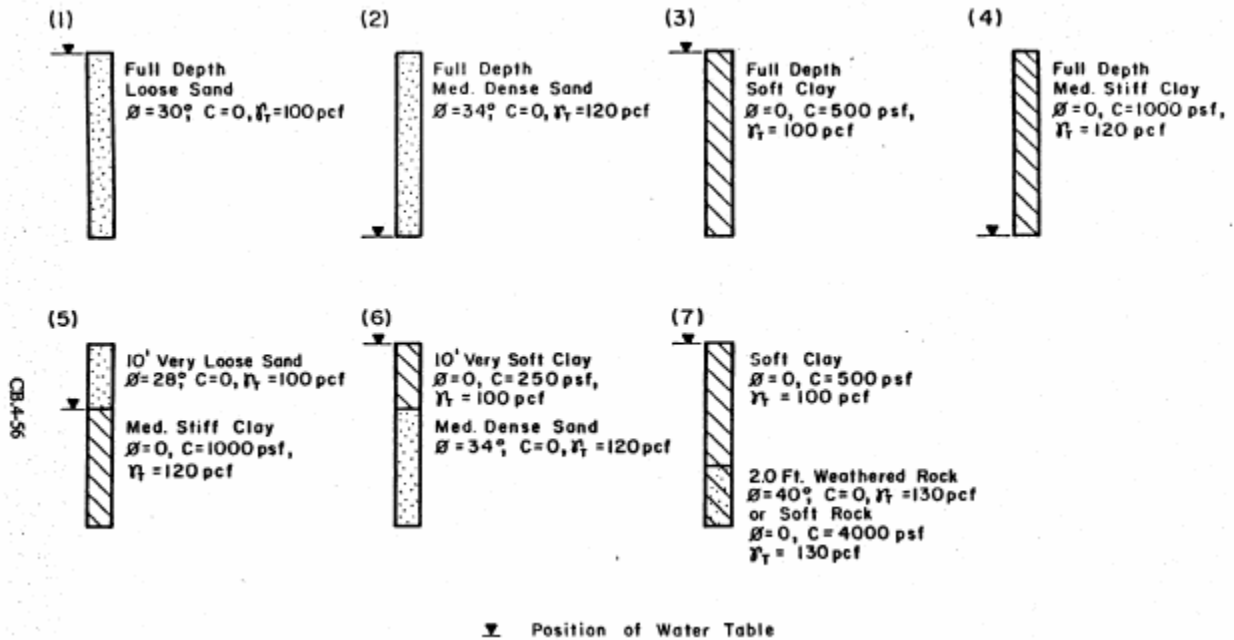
Lateral Pile Loading Soil Profiles
